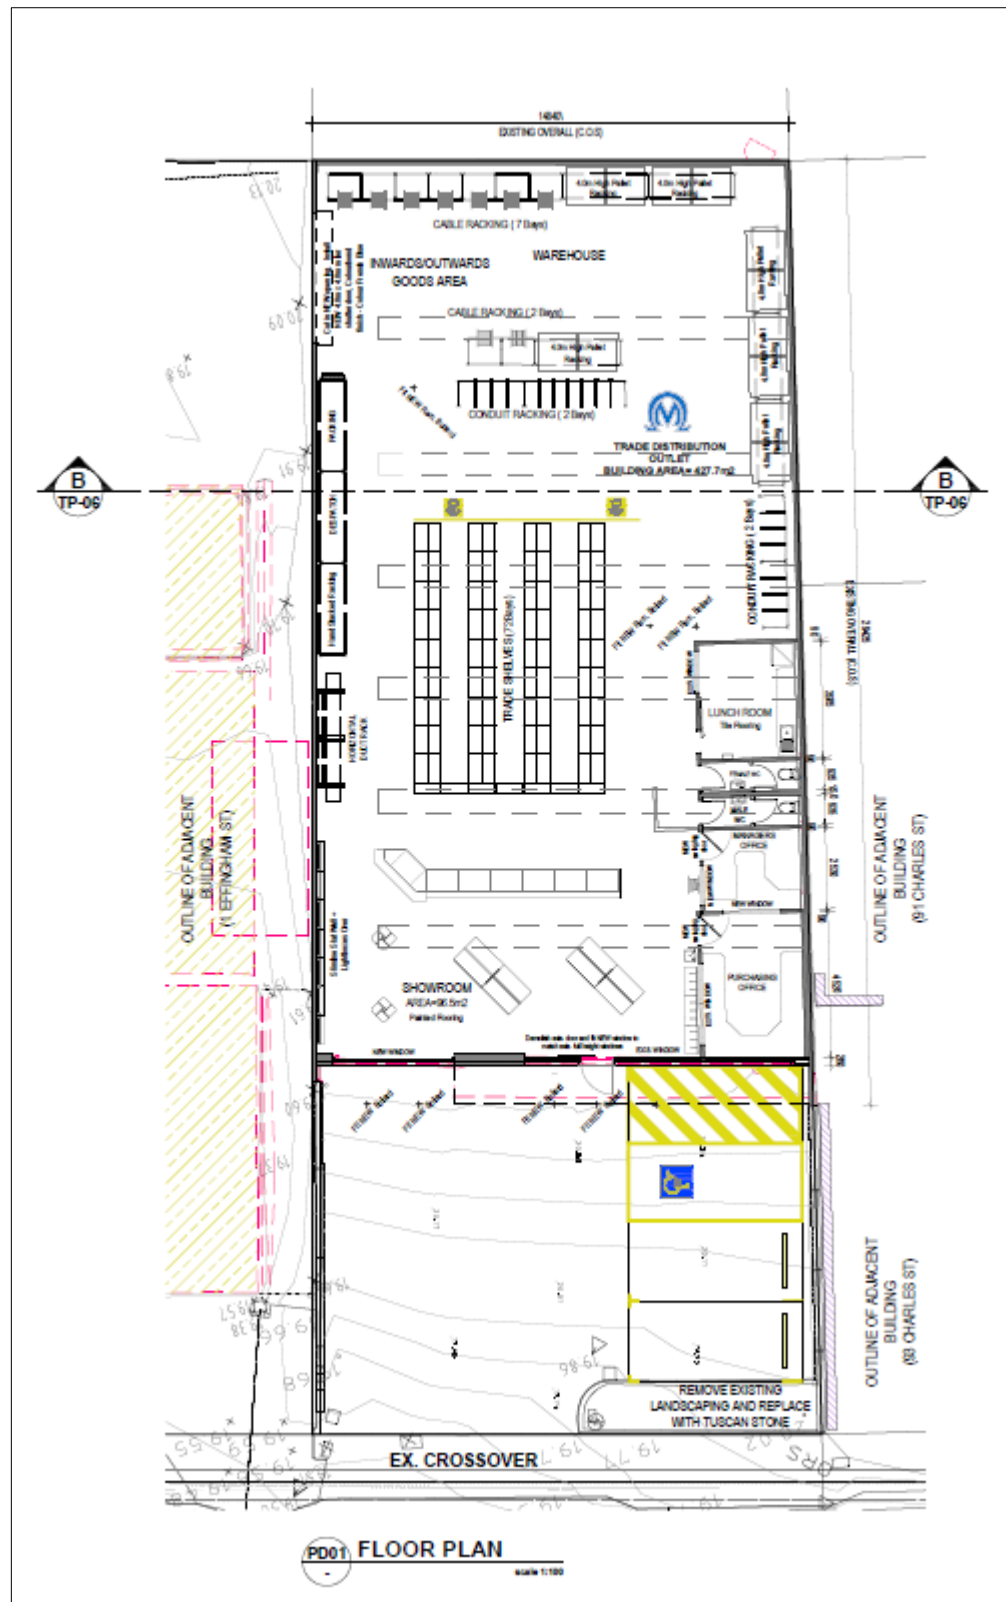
Floor plan of refurbished warehouse at 7 Effingham Street
